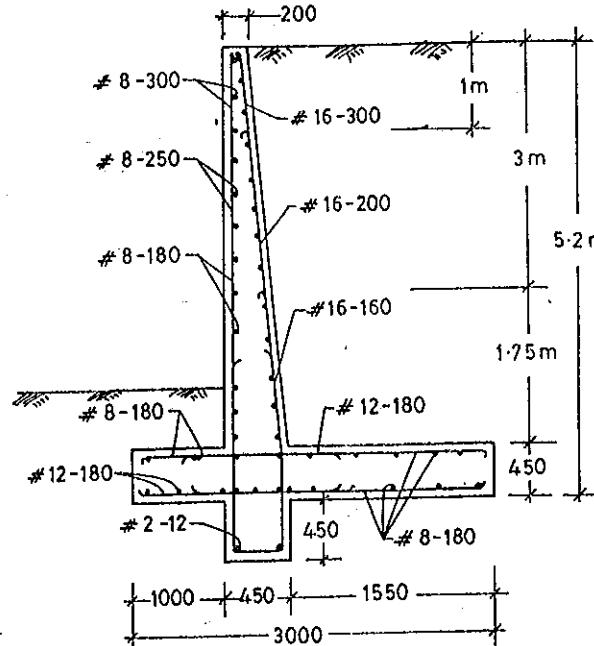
Reinforcement Details in Cantilever Retaining Wall
